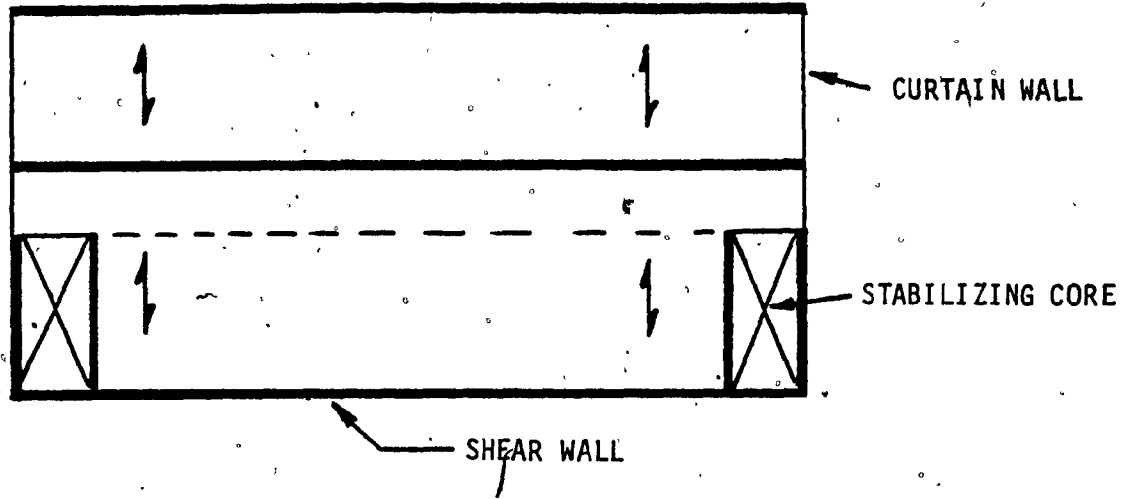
LONGITUDINAL WALL SYSTEM, (REF.2)
